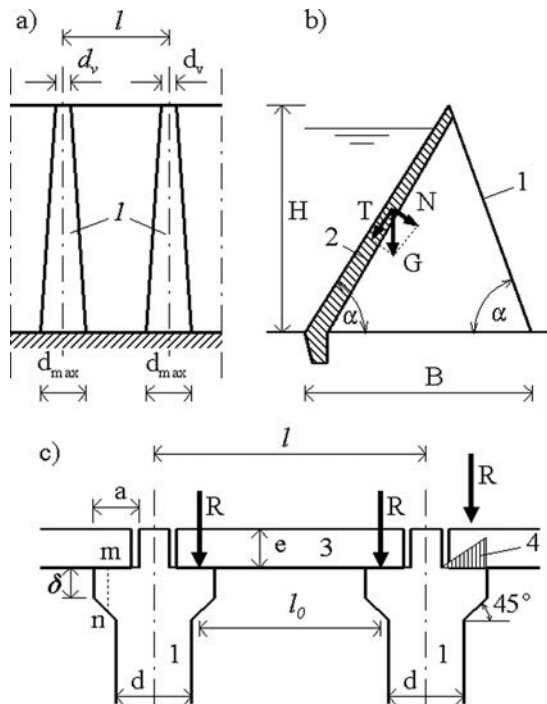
Schematic review of a flat-slab buttress dam. (a) Vertical section; (b) cross-section; (c) plan. (1) Buttress; (2) flat-slab deck; (3) reinforced concrete slab; (4) diagram of the reaction.
